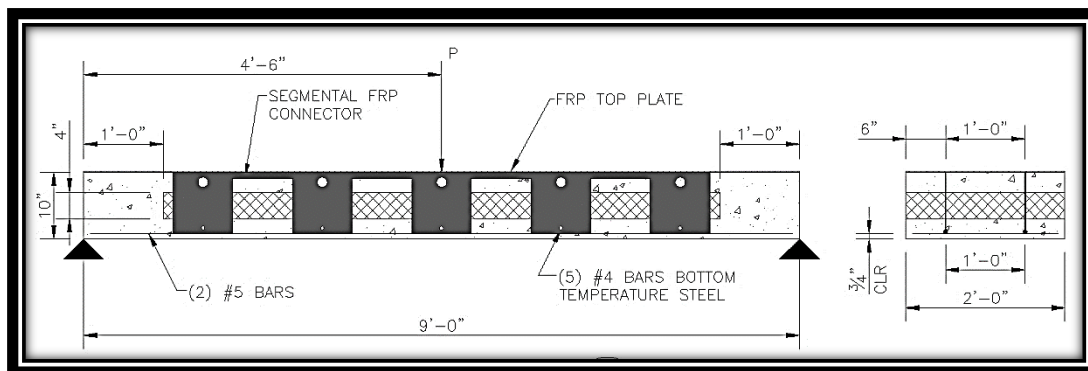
Segmental Shear Connector w/FRP Plate Layout
